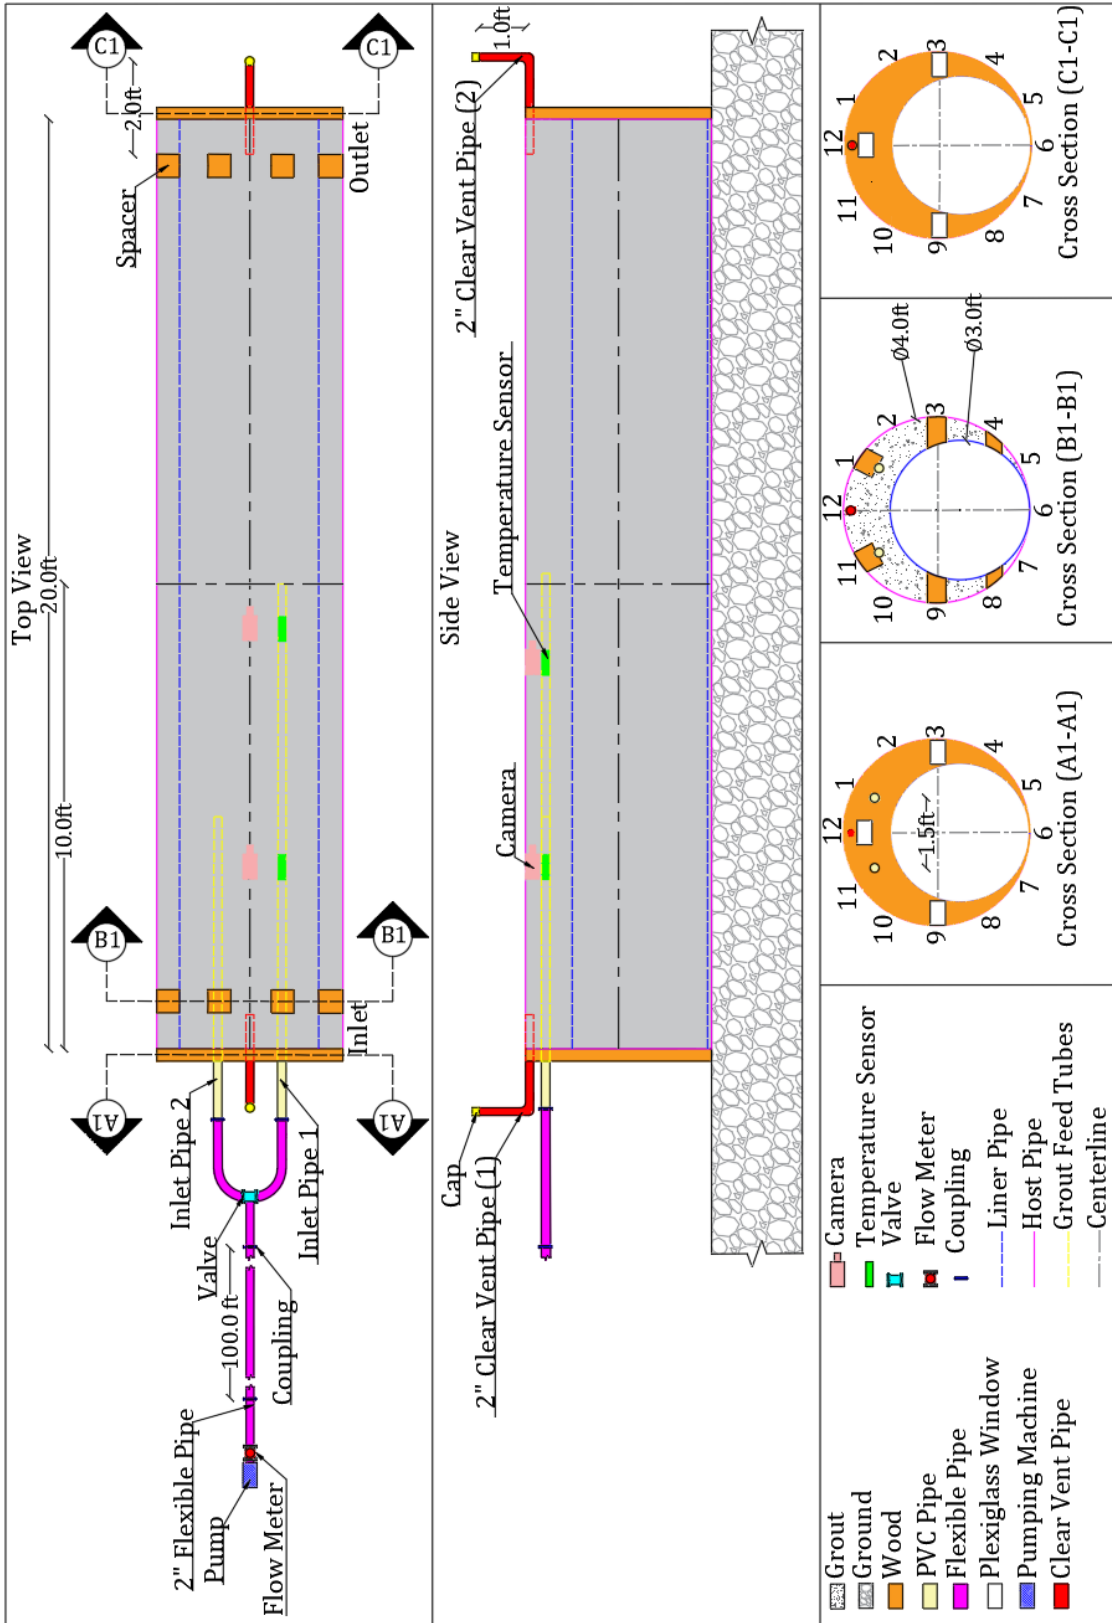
Layout for Grout Pumping Tests in Phase 3.
